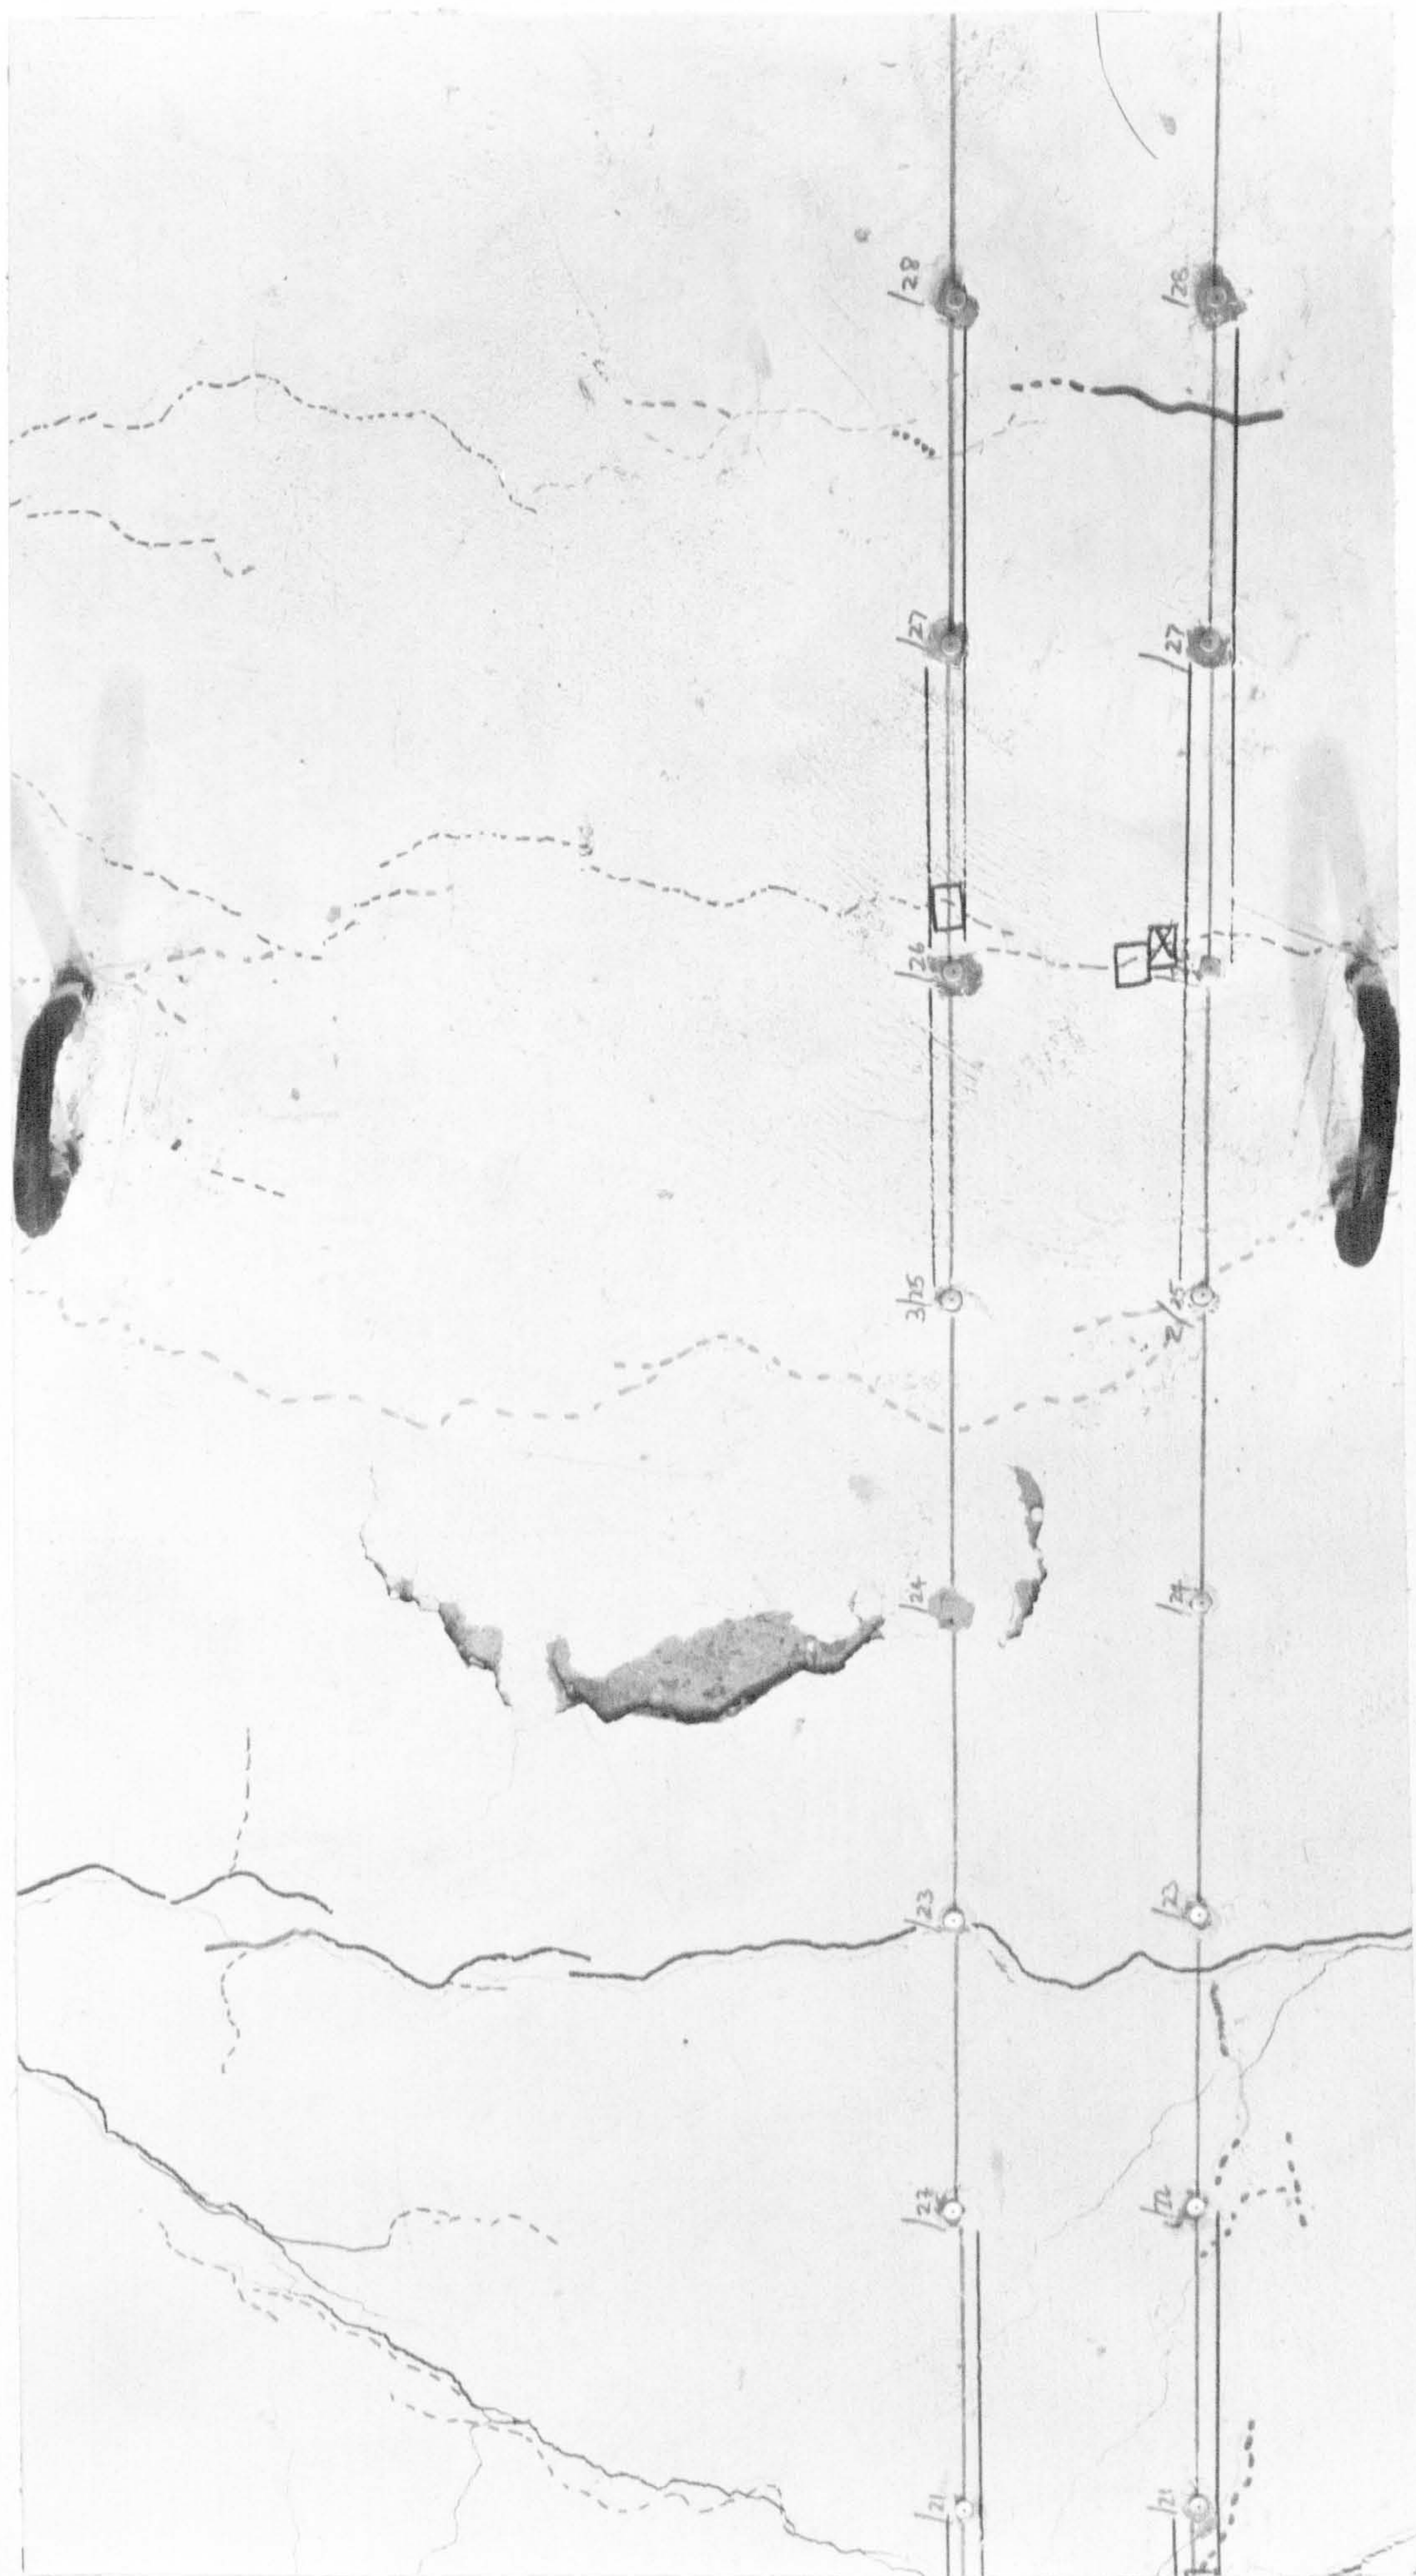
CRACKING IN TOP SURFACE OF SLAB, BEAM PG1B
